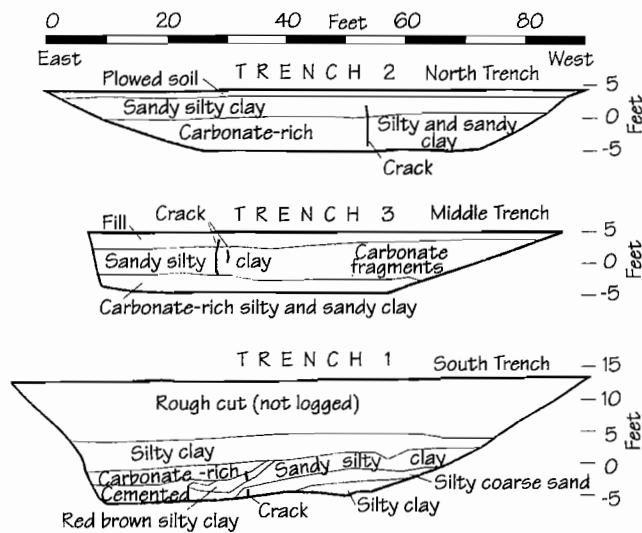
Generalized logs of trenches excavated across earth fissure on pond site. Trench locations on Figure 1.
